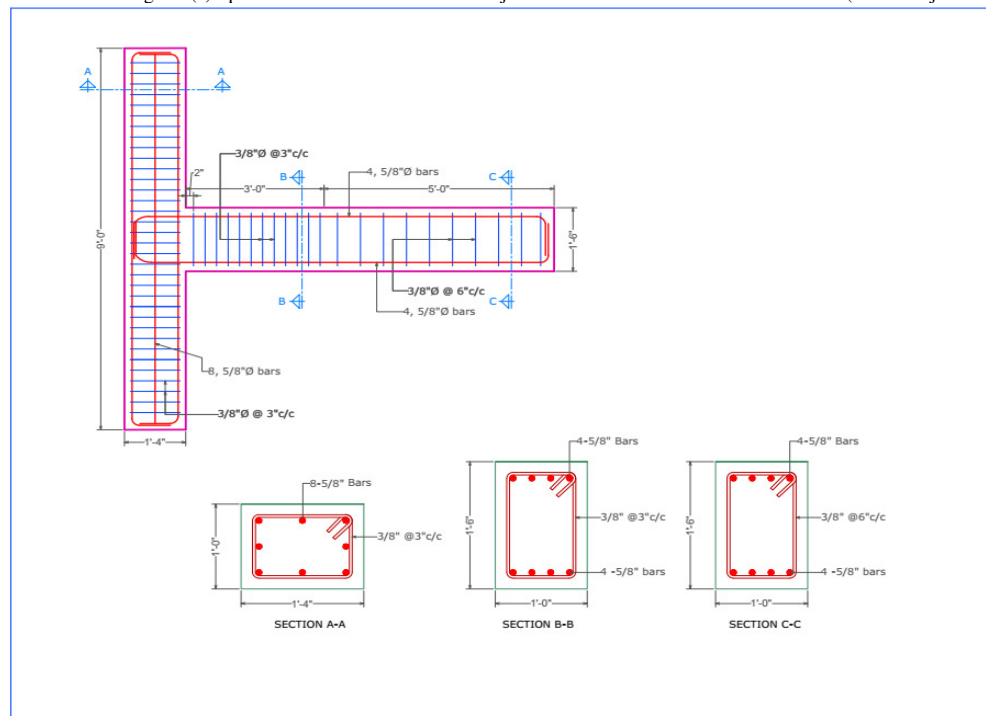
(b) Specimens SJ-NC, reinforcement details
